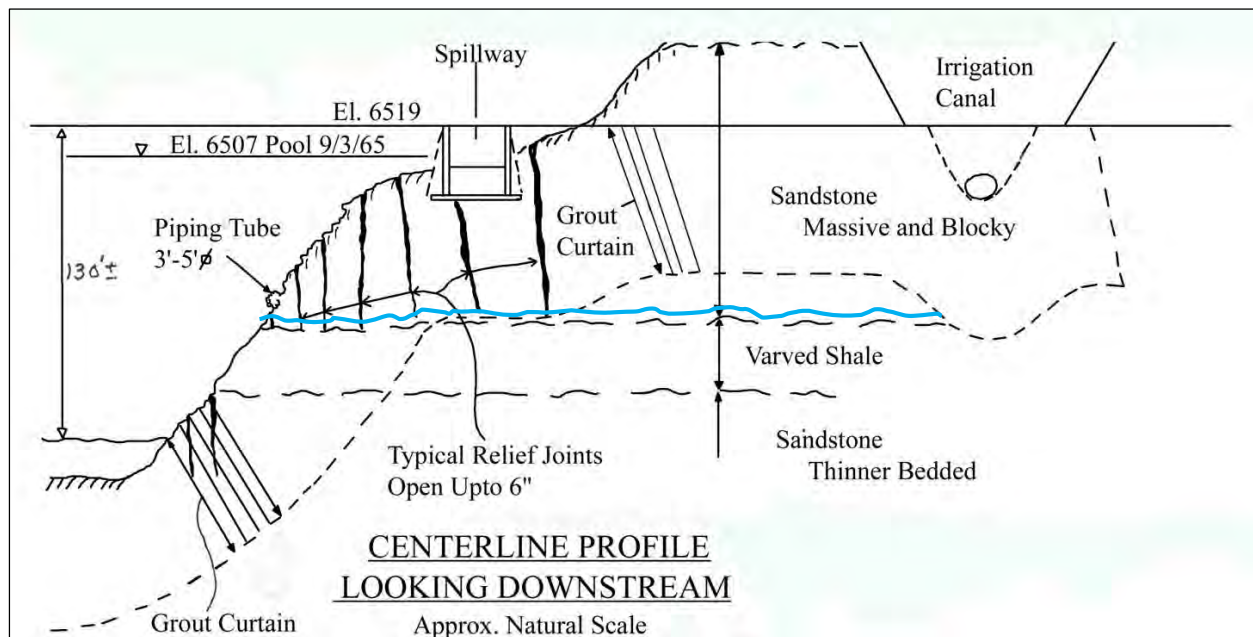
Section into the right abutment, showing vertical stress relief joints and prominent horizontal leakage plane (top of Varved Shale).
